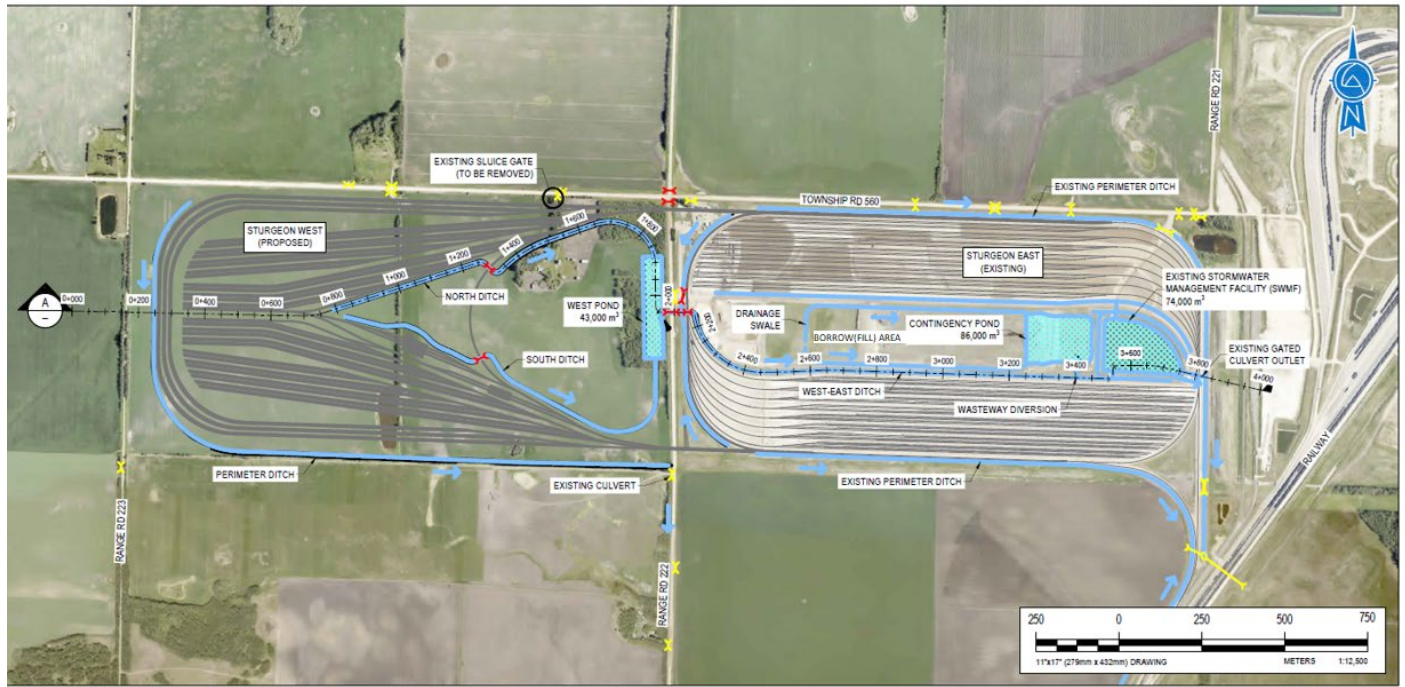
Cando Stormwater Management Plan General Arrangement
